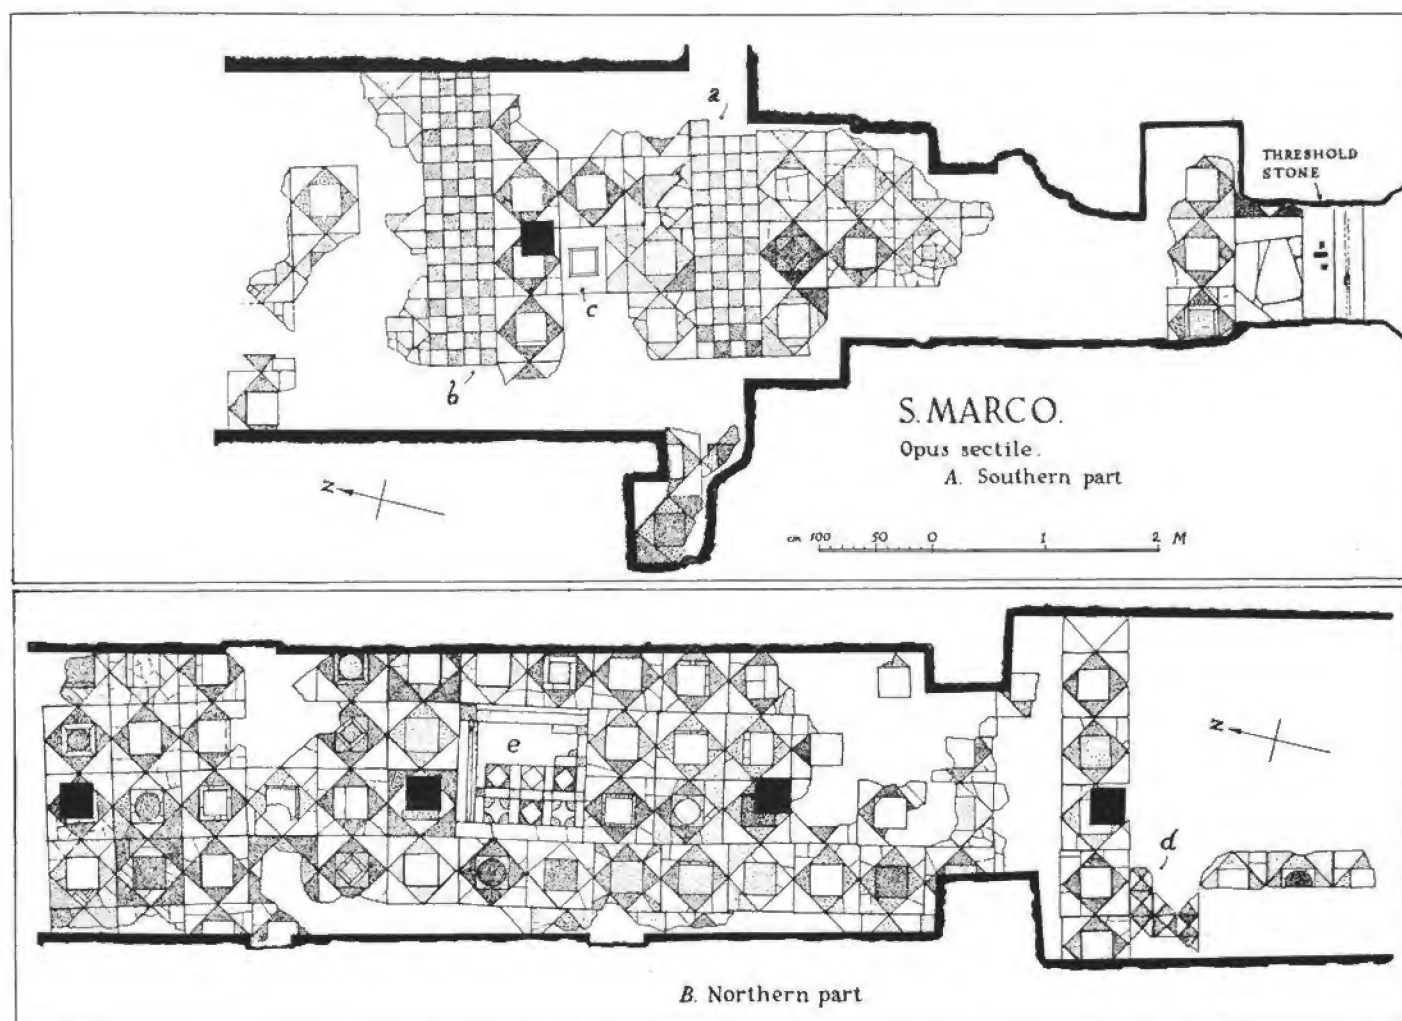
S. Marco. *Sectile* pavement of the First Church (Plan: A. Corbett).
